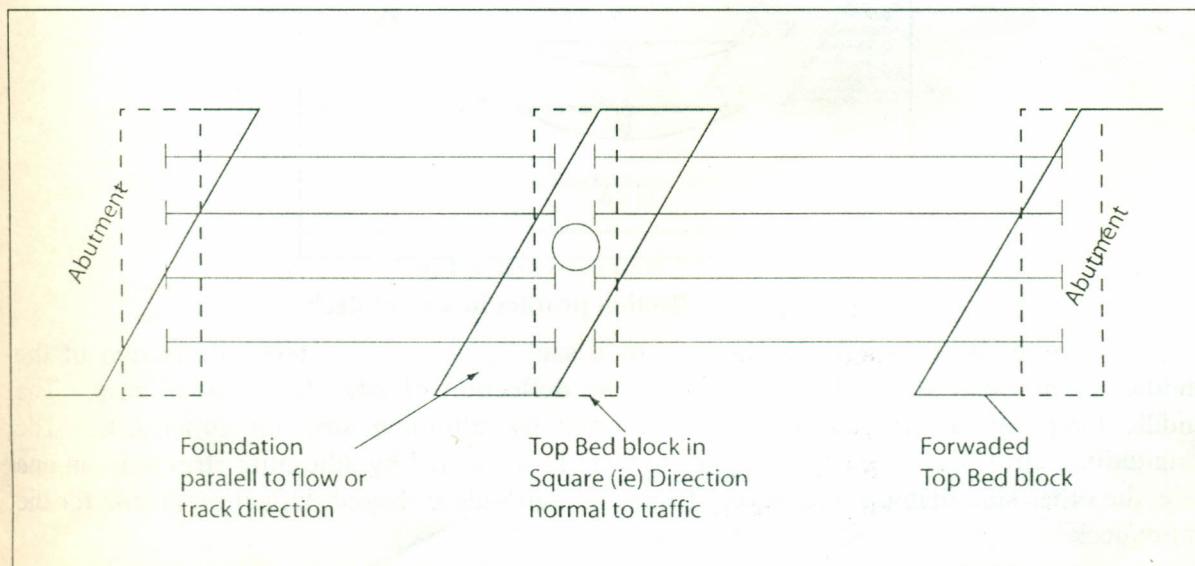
Skew spans converted as right span girders by placement of bed block on top of pier.
